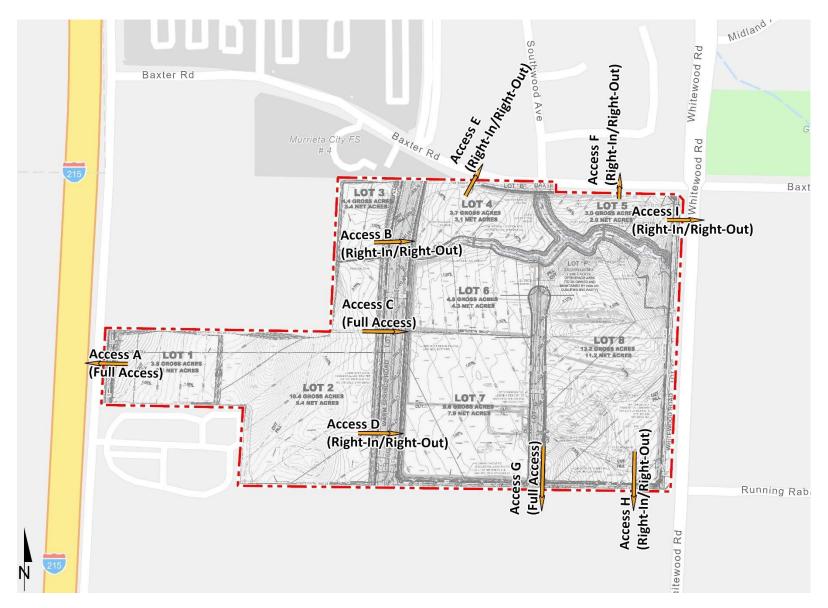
PRELIMINARY SITE PLAN
